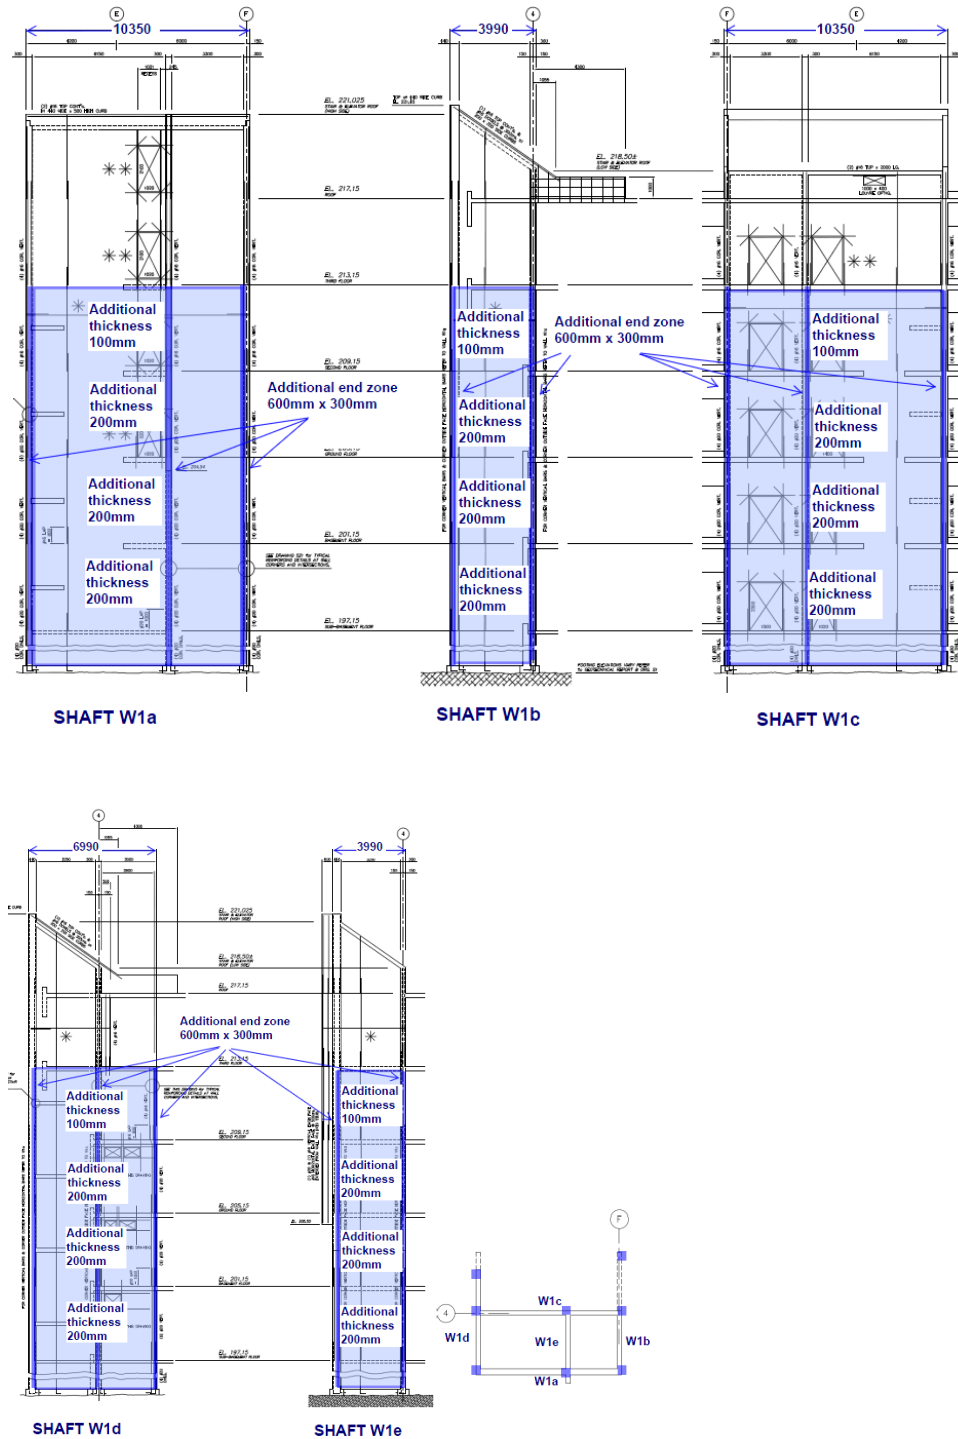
Retrofit areas in walls and shafts under DFAIT 100% loading
